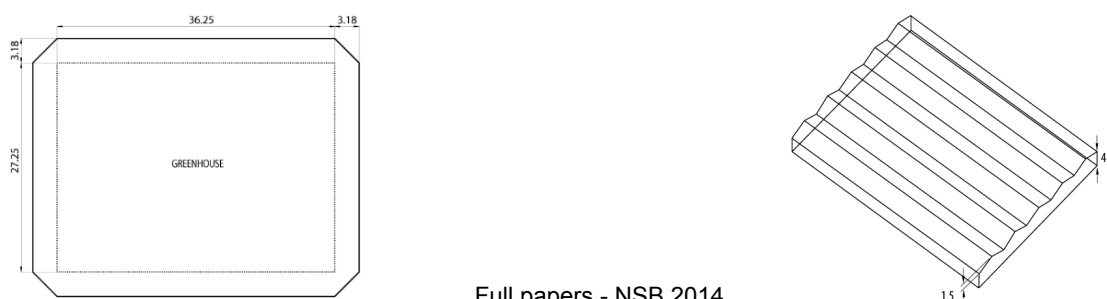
Office roof plan, greenhouse footprint, and axonometric
